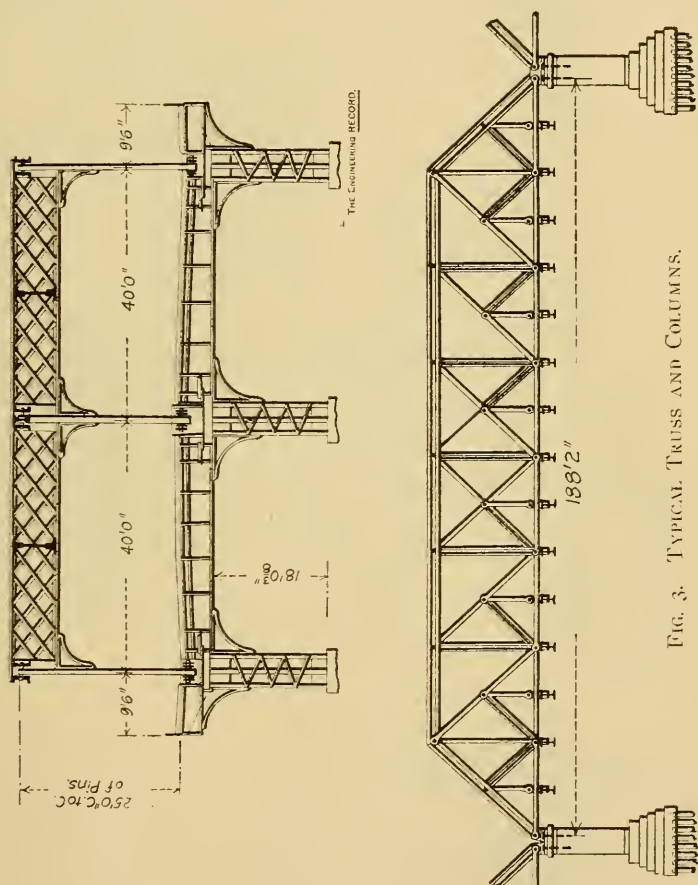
TYPICAL TRUSS AND COLUMNS.
